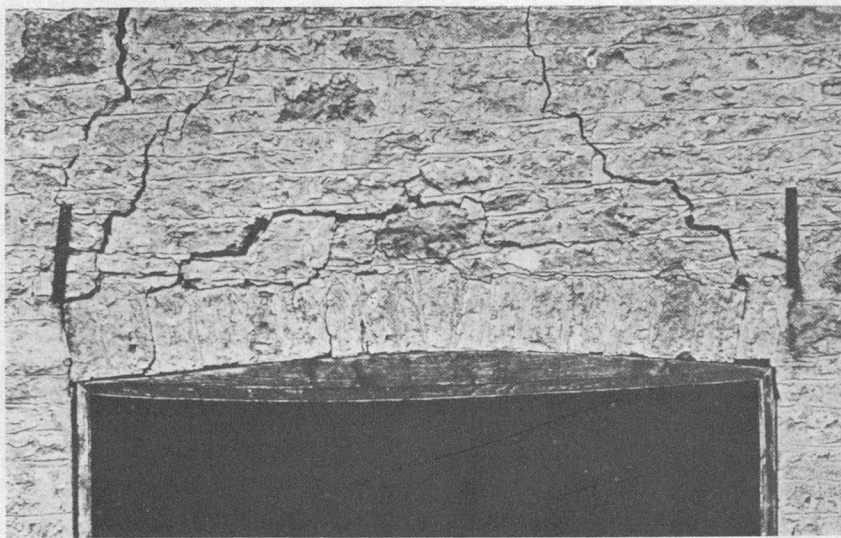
Fractures formed in rock wall where supporting beam has been bent downward by weight of overlying rocks. From Cox (1914, photograph in plate 12; name of photographer not known).
